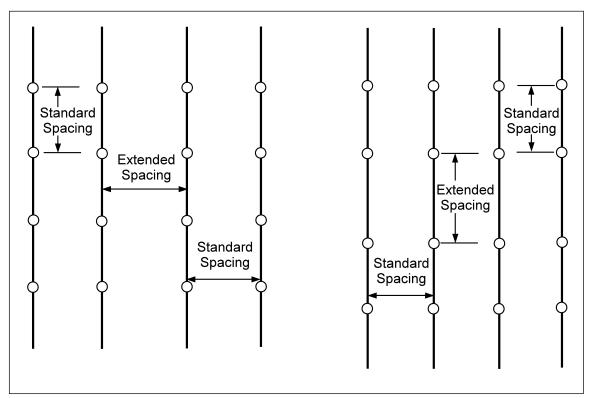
Permissible sprinkler spacing extension.
